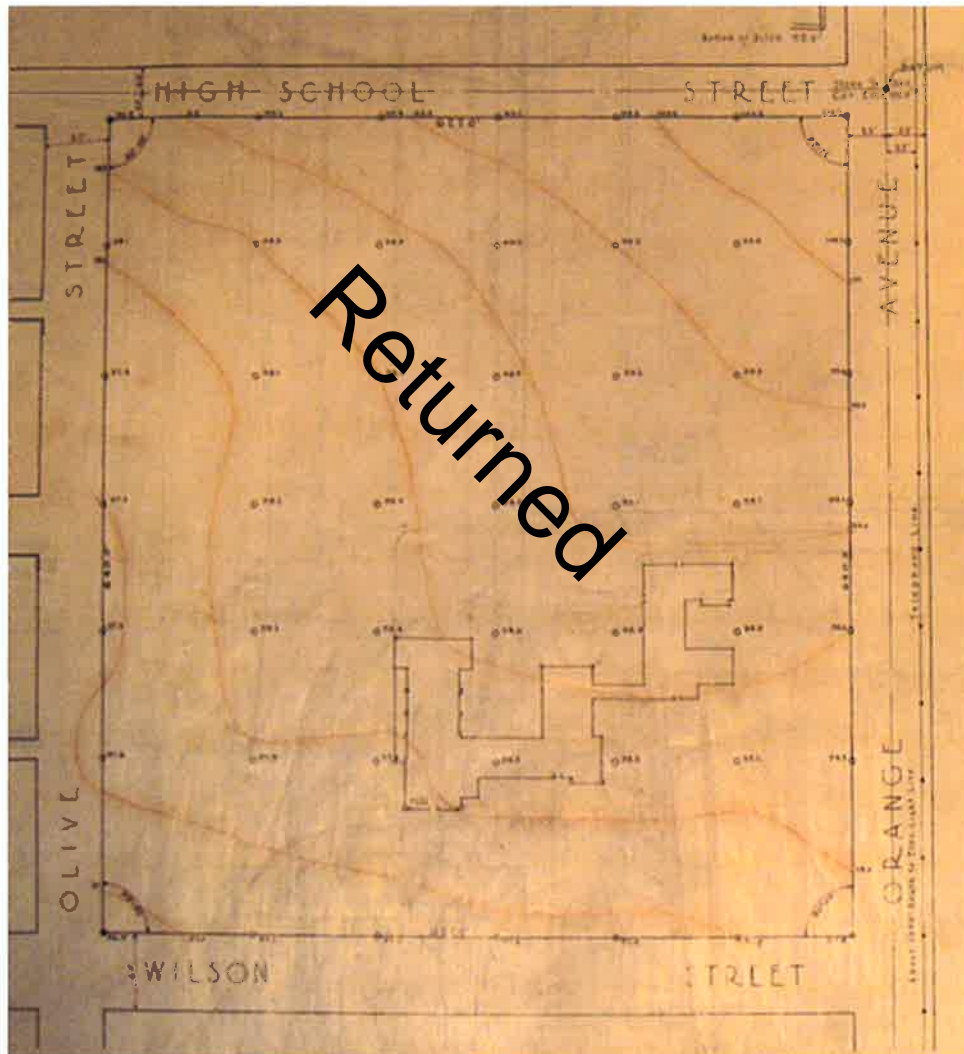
Plan of Grounds, Peoria High School, December 1920.
